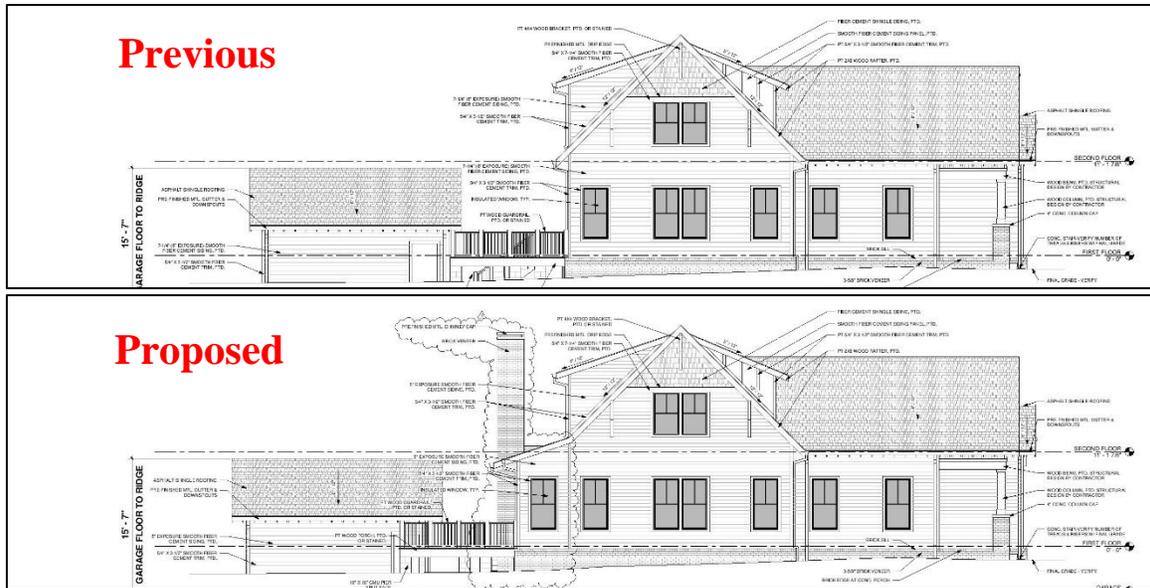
(above) shows the previously approved left façade and Figure 5 (below) shows the proposed left façade. Note that the changes to the gable details were approved by MHZC in December.
